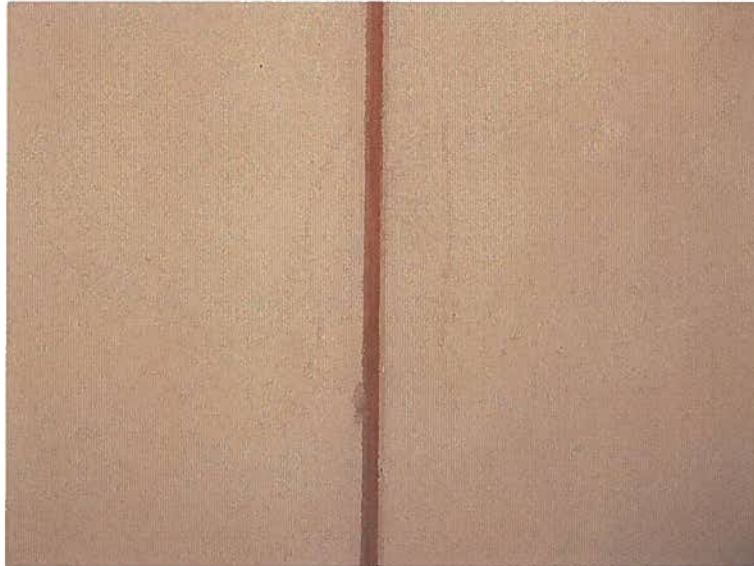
Short vertical cracks on each side of vertical panel joint (Brenner photo)
